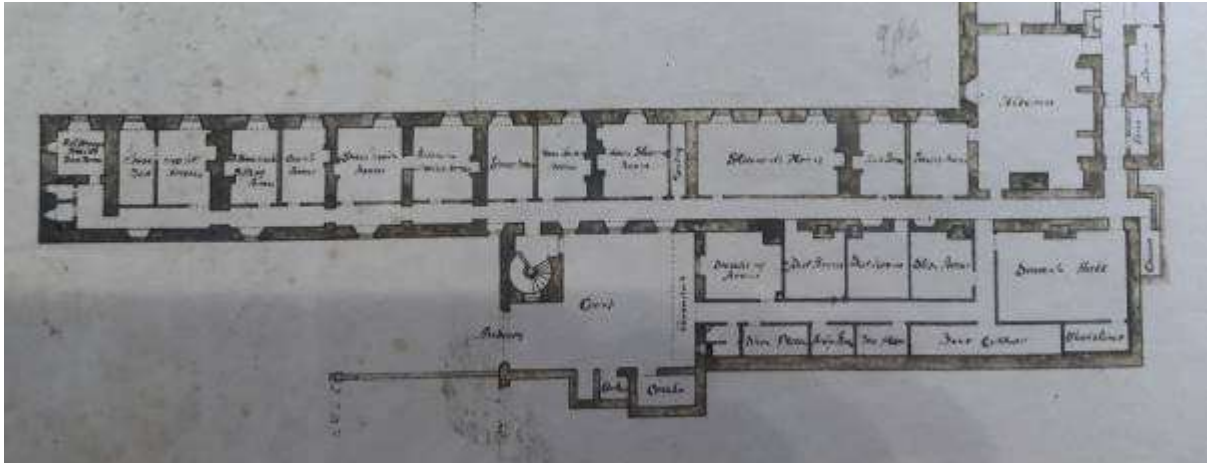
Ground floor survey plan, post 1885, pre 1920 showing gateway & infilled courtyard. BCA.
